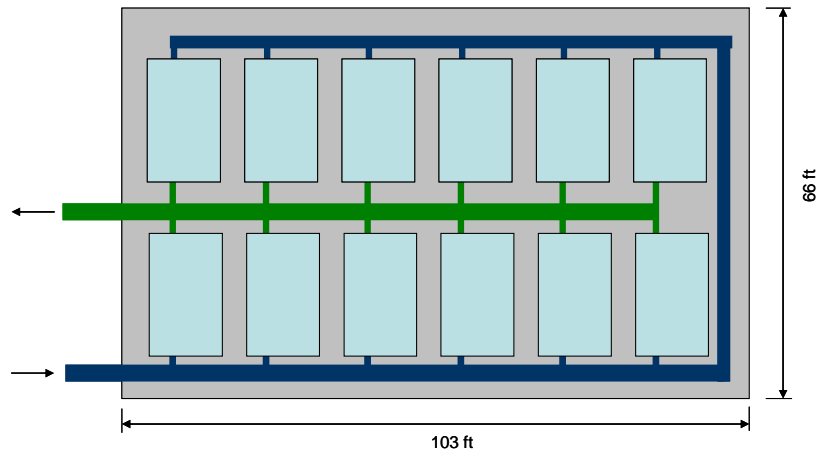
Example chiller layout and piping on Cresta Reach (Not to Scale)
